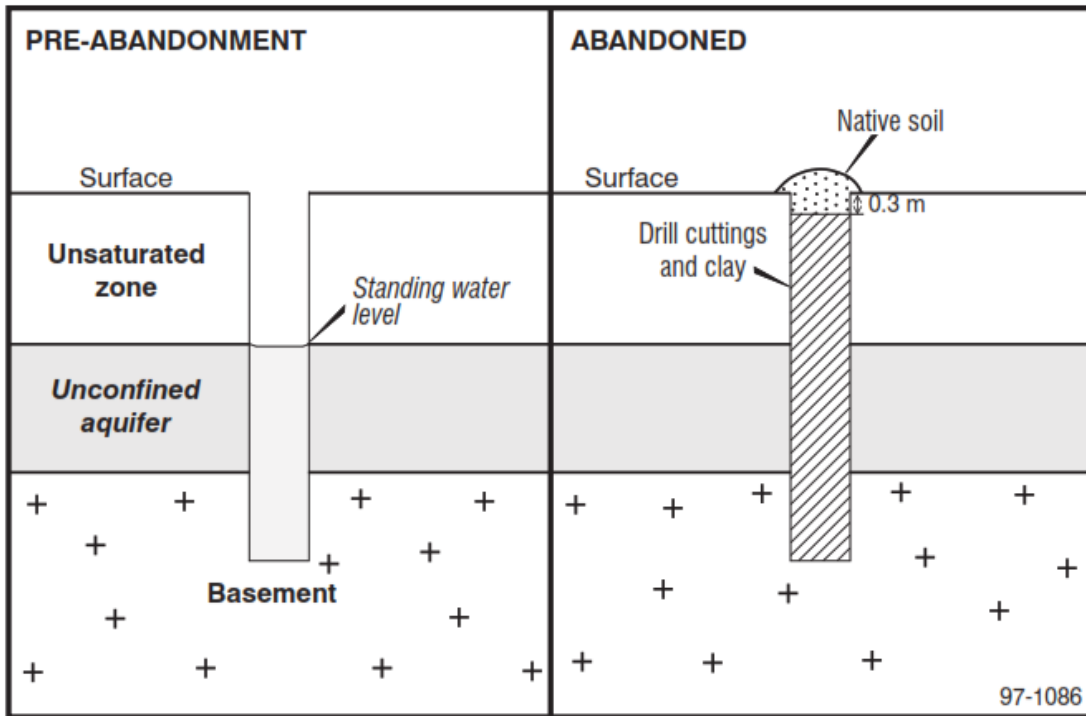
Diagram of backfilling drillholes. Source: M21: Mineral Exploration Drillholes - General specifications for construction and backfilling
